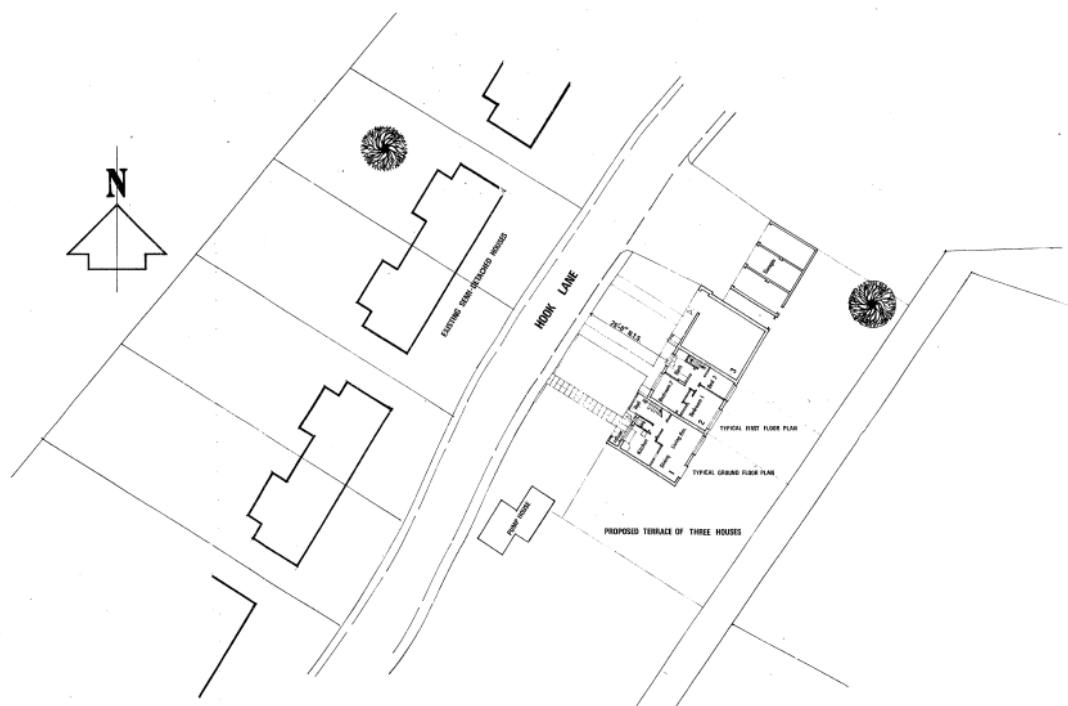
Location of proposed dwellings on Hook Lane (not to scale)
